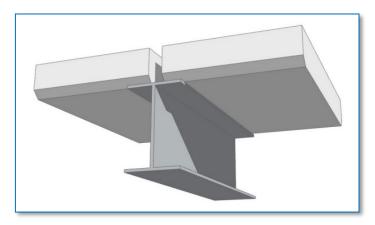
Substandard bearing on a 100mm wide steel beam. Source (Institution of Structural Engineers, 2023)
